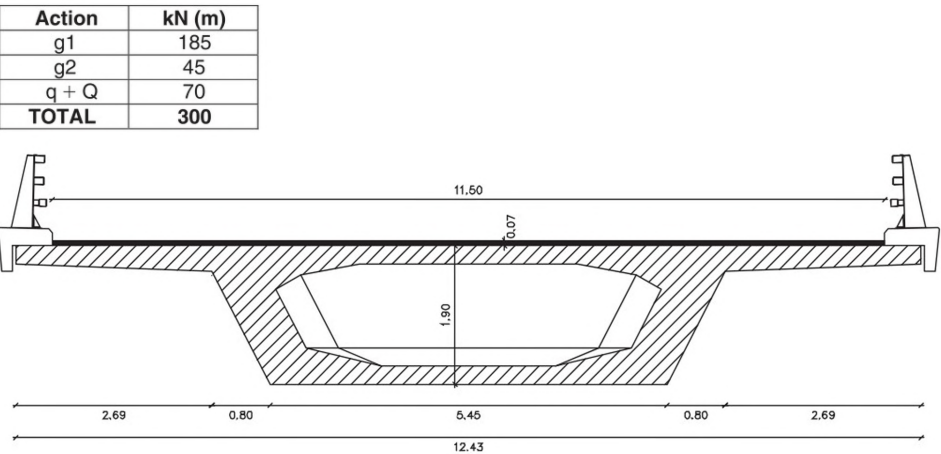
Typical cross section of a continuous road bridge. $L_{\max} = 49$ m.
